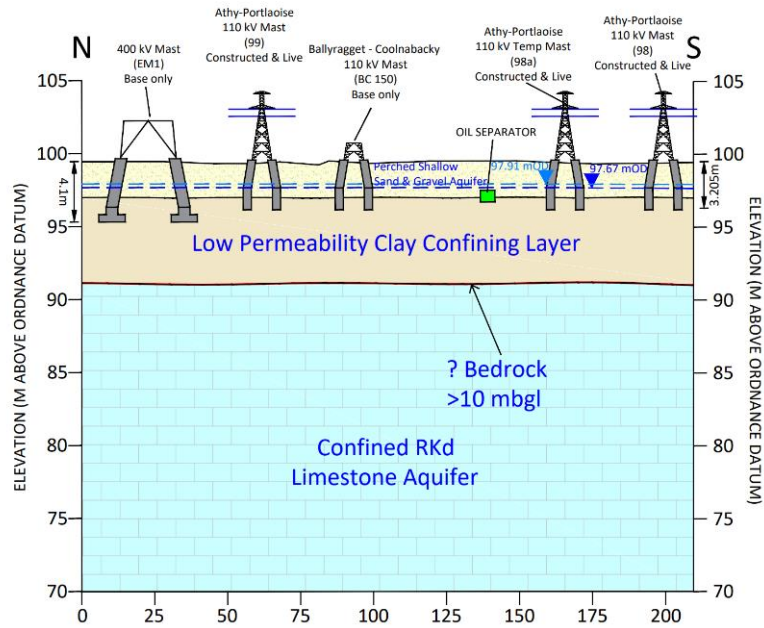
North- South Cross Section detailing existing Structures and Oil Separator
